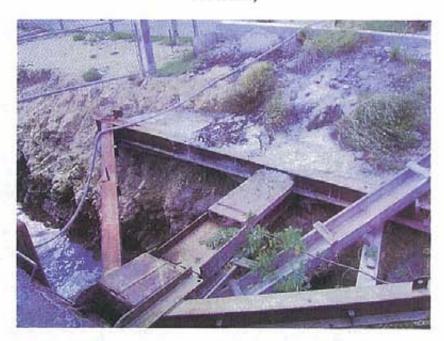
Evidence of concrete spillage from an on-site construction activity (possibly the construction of the concreted area itself or the berm) toward the receiving water. It is unclear if any of the concrete actually entered the receiving water, although concrete observed on the very edge of the metal frame work would indicate that it did. However this photo demonstrates a lack of effective best management practices utilized for the construction project by the Discharger this close to the edge of the receiving water.
